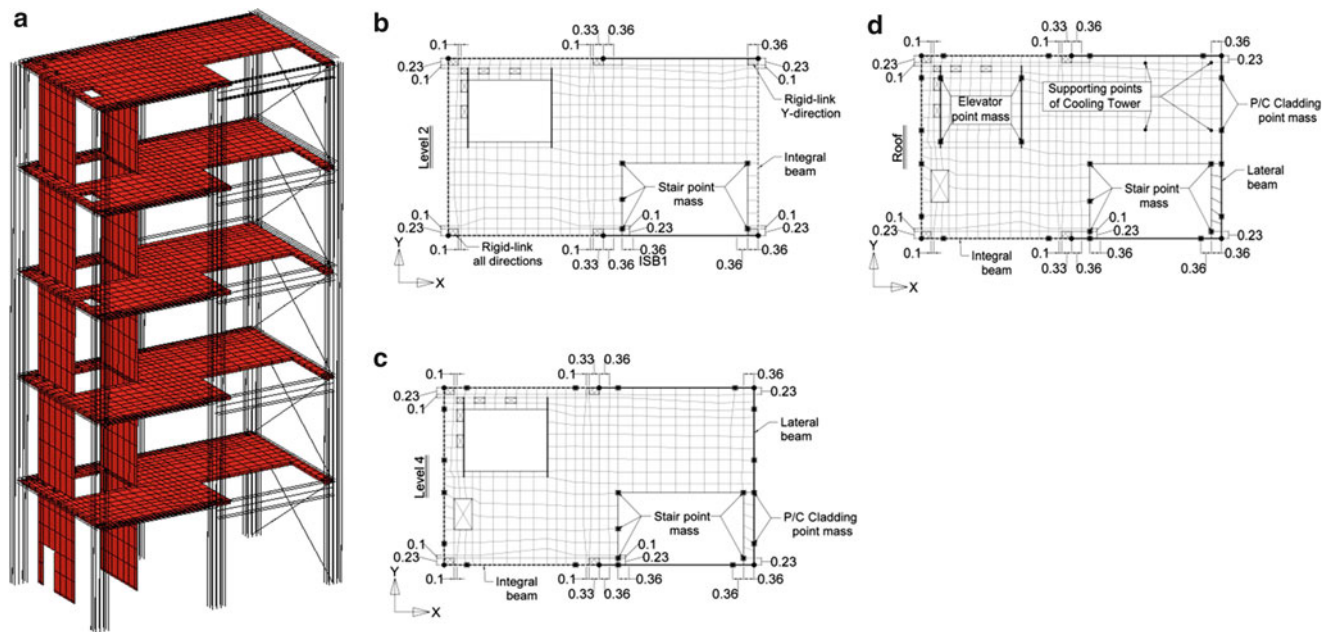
FE mesh of test specimen: (a) 3D view, floor view of (b) level 2, (c) level 4, and (d) roof
